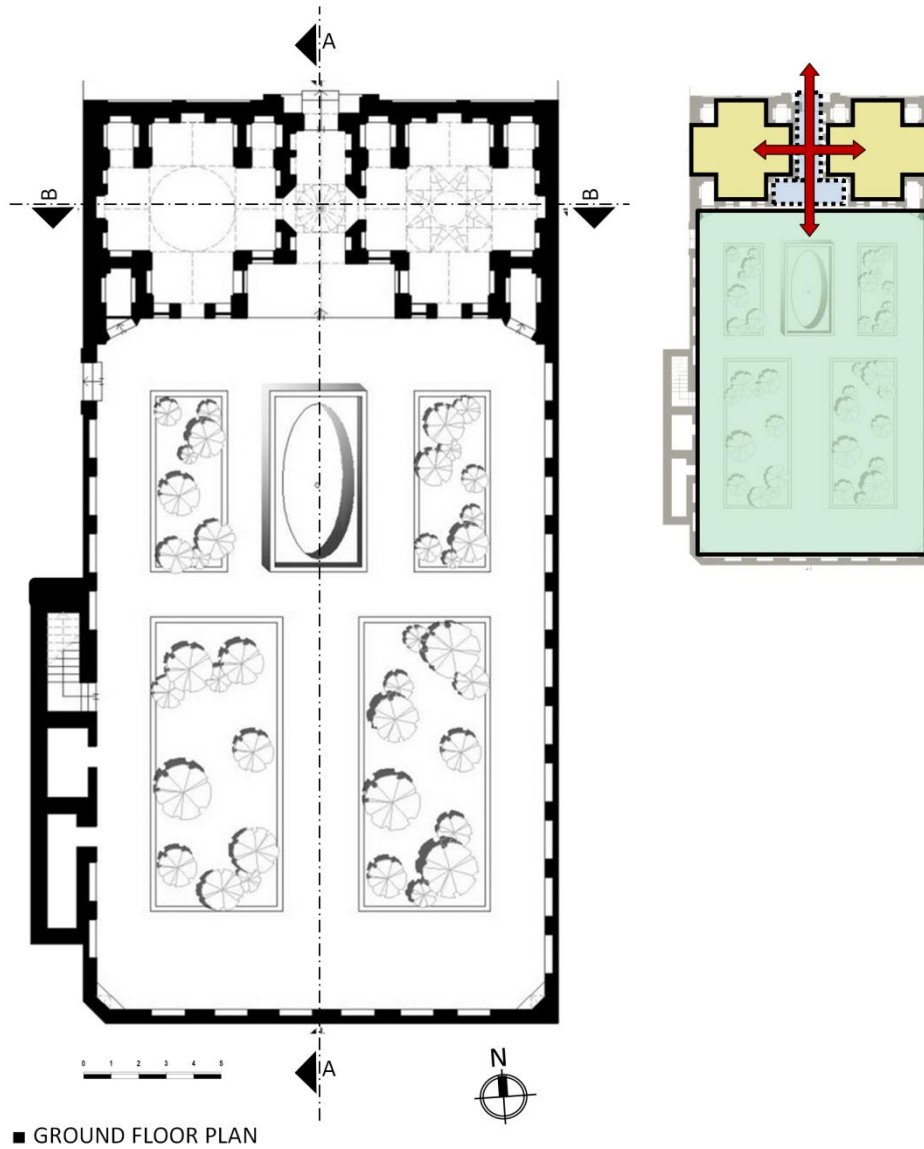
plan of the Mashhadi building (Estaji, 2010)
